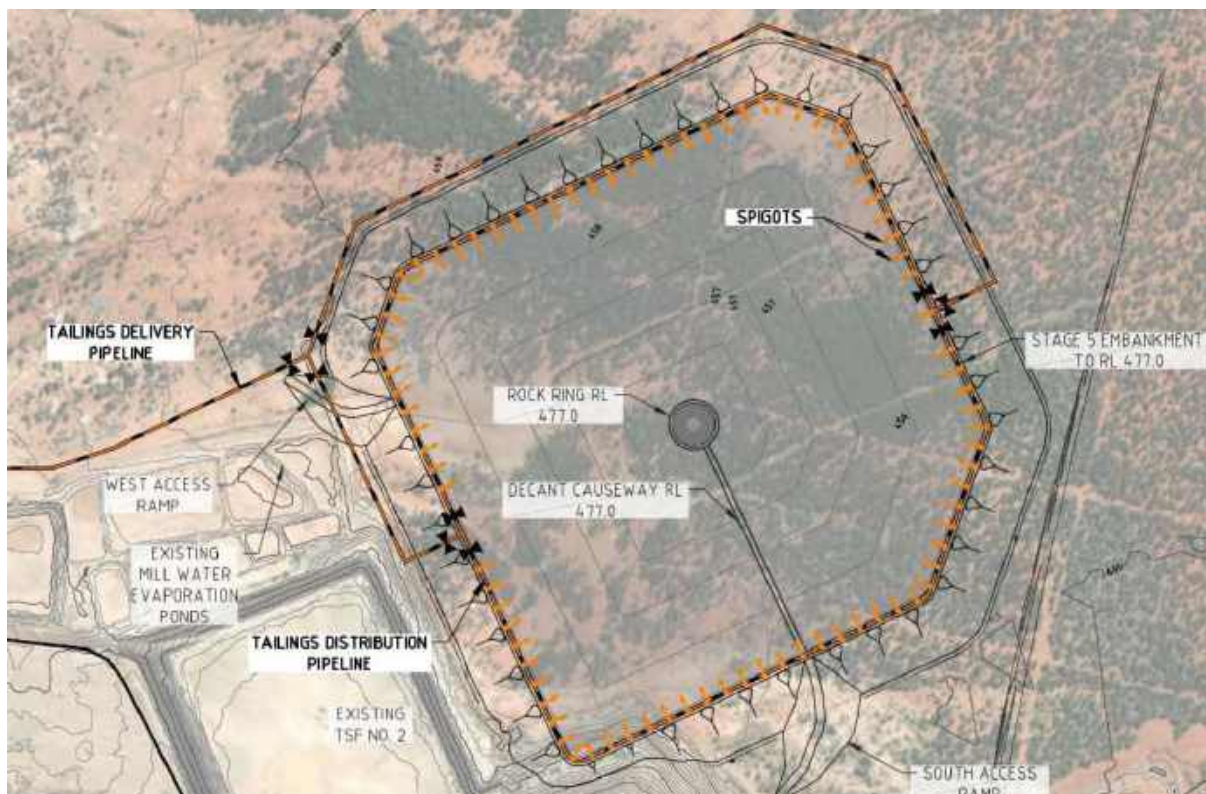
Tailings pipeline layout concept (TailCon 2025a)
